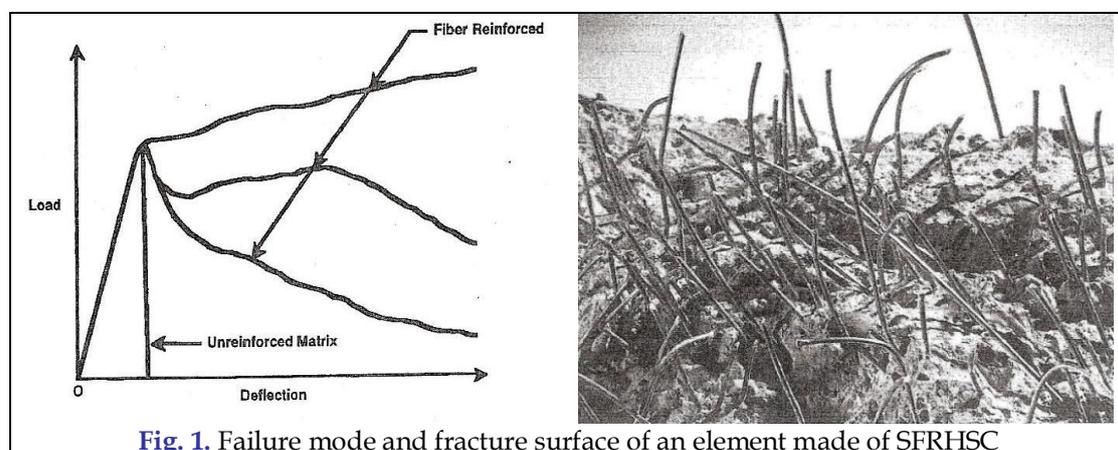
Failure mode and fracture surface of an element made of SFRHSC
